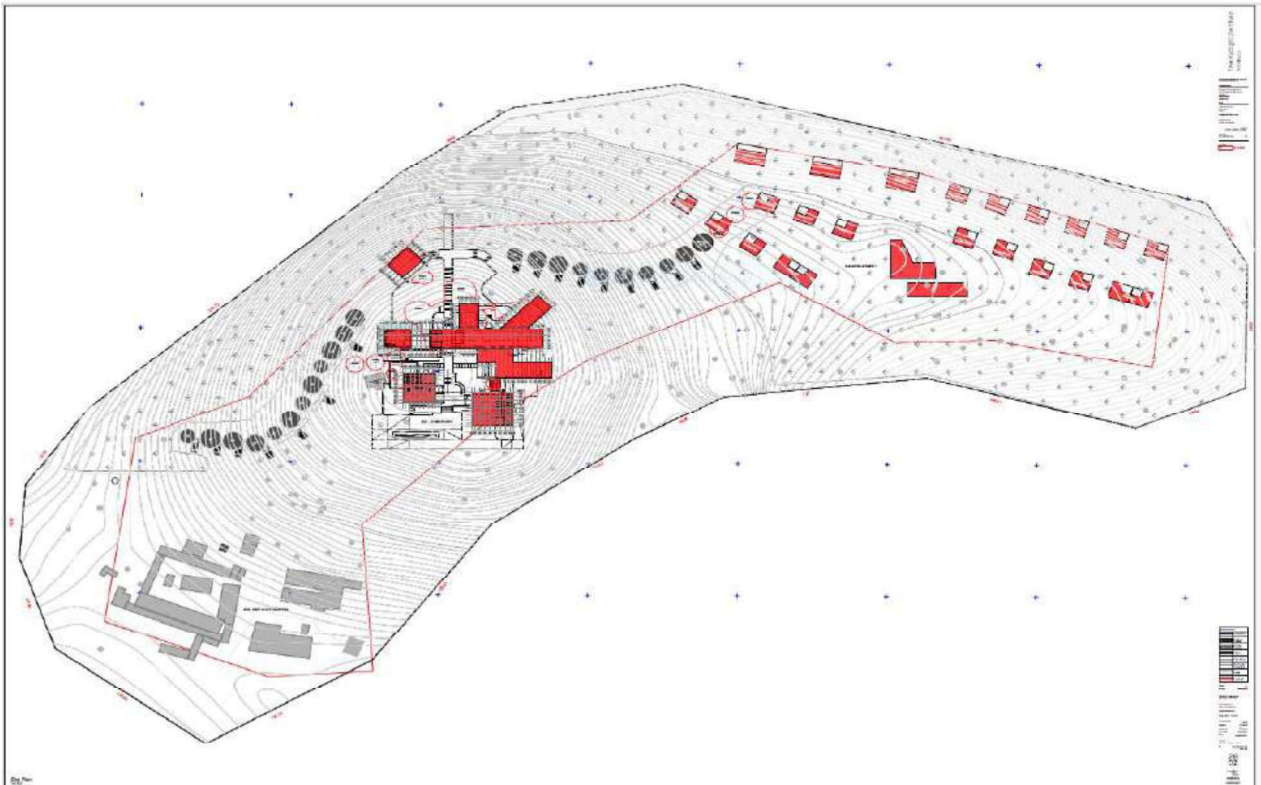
1: Site layout plan of the existing, under renovation, demolished and the proposed new presidential suites at Ngorongoro Sopa Lodge
